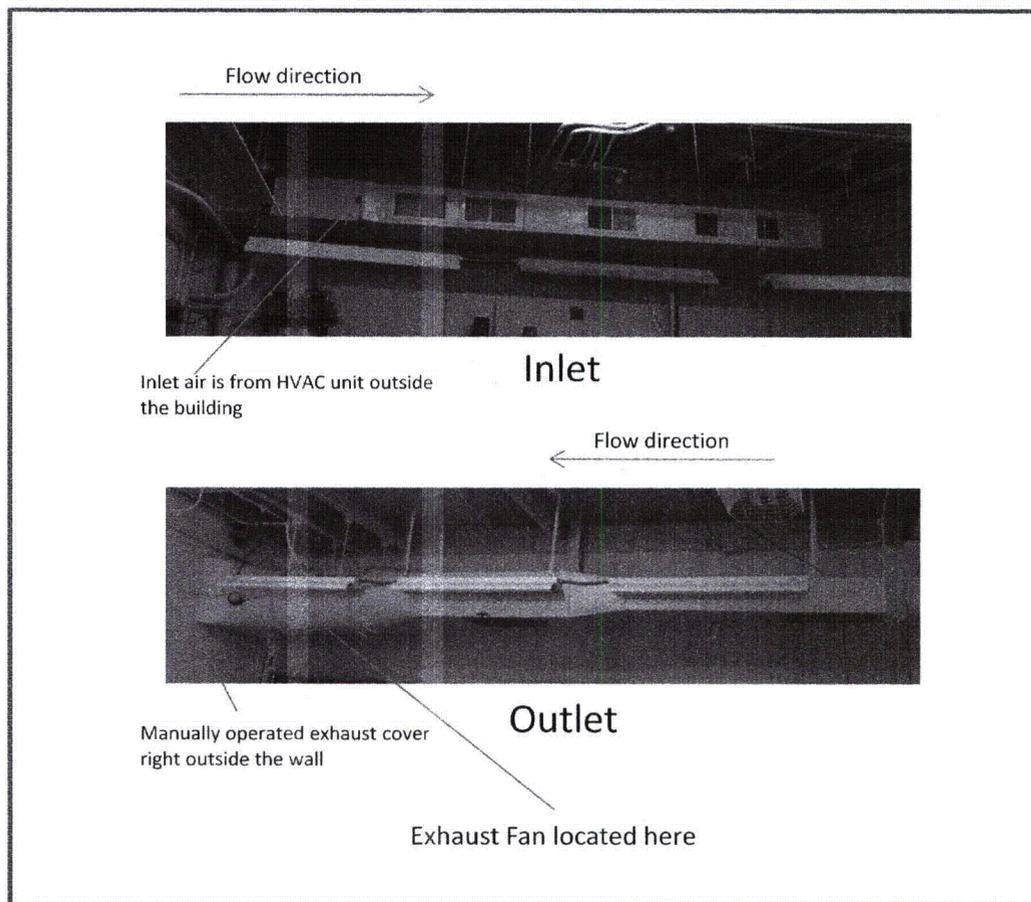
Reactor room HVAC system showing Inlet and outlet units
